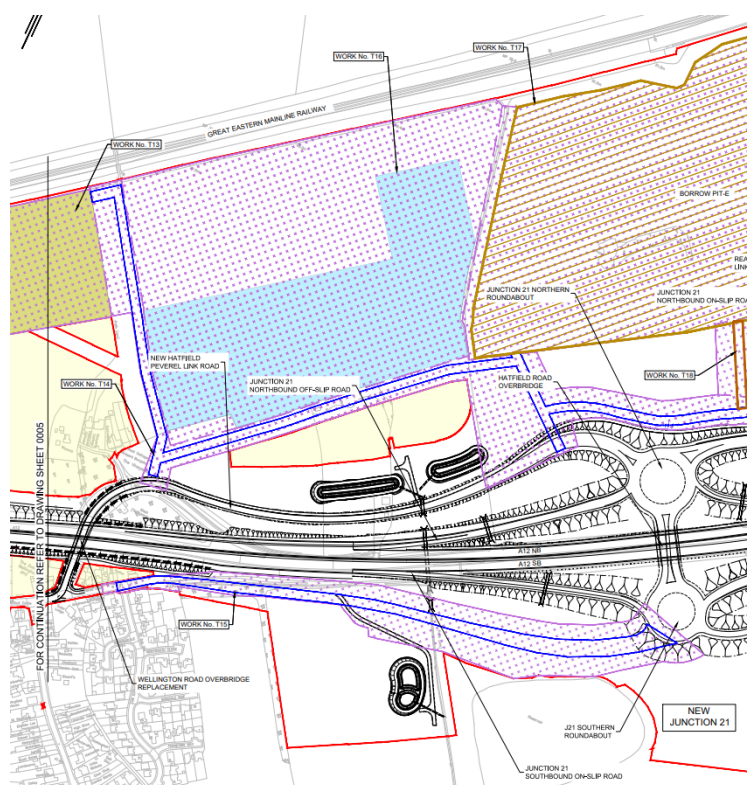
Sheet 6 of the Temporary works plan highlighting the location of the proposed J20B compound (shown by blue shading).
